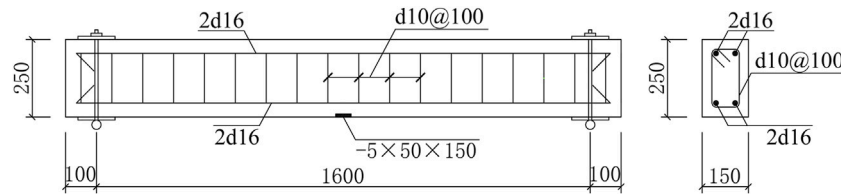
| Specimen dimensions and reinforcement layout of the beam (mm).
